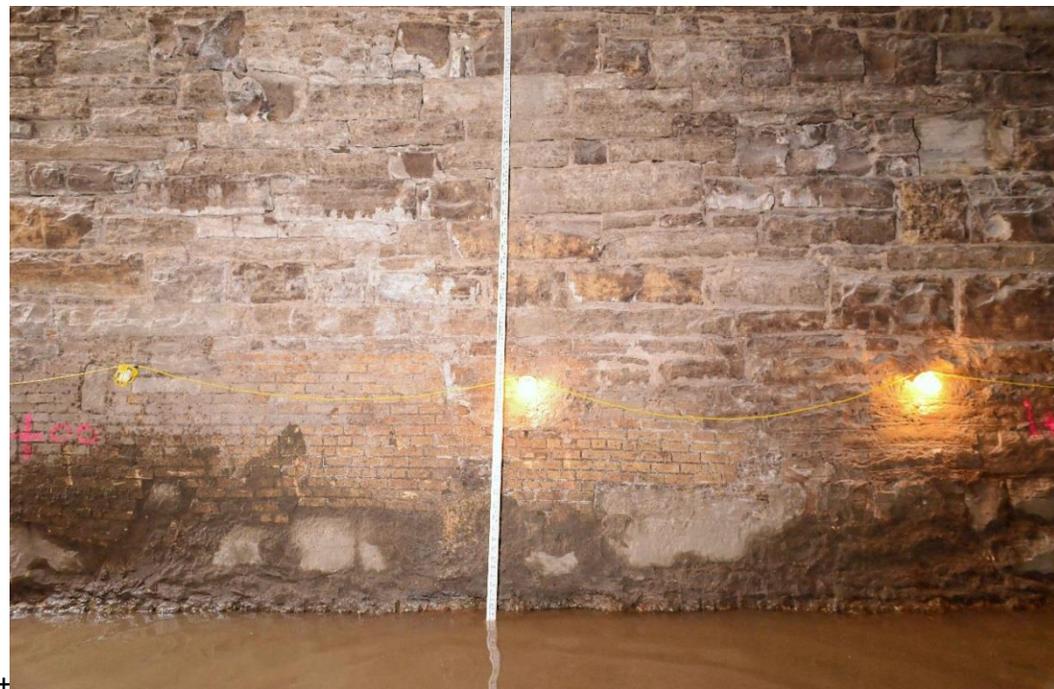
Brick patch and missing mortar (Station 1+00 to Station 1+25).
